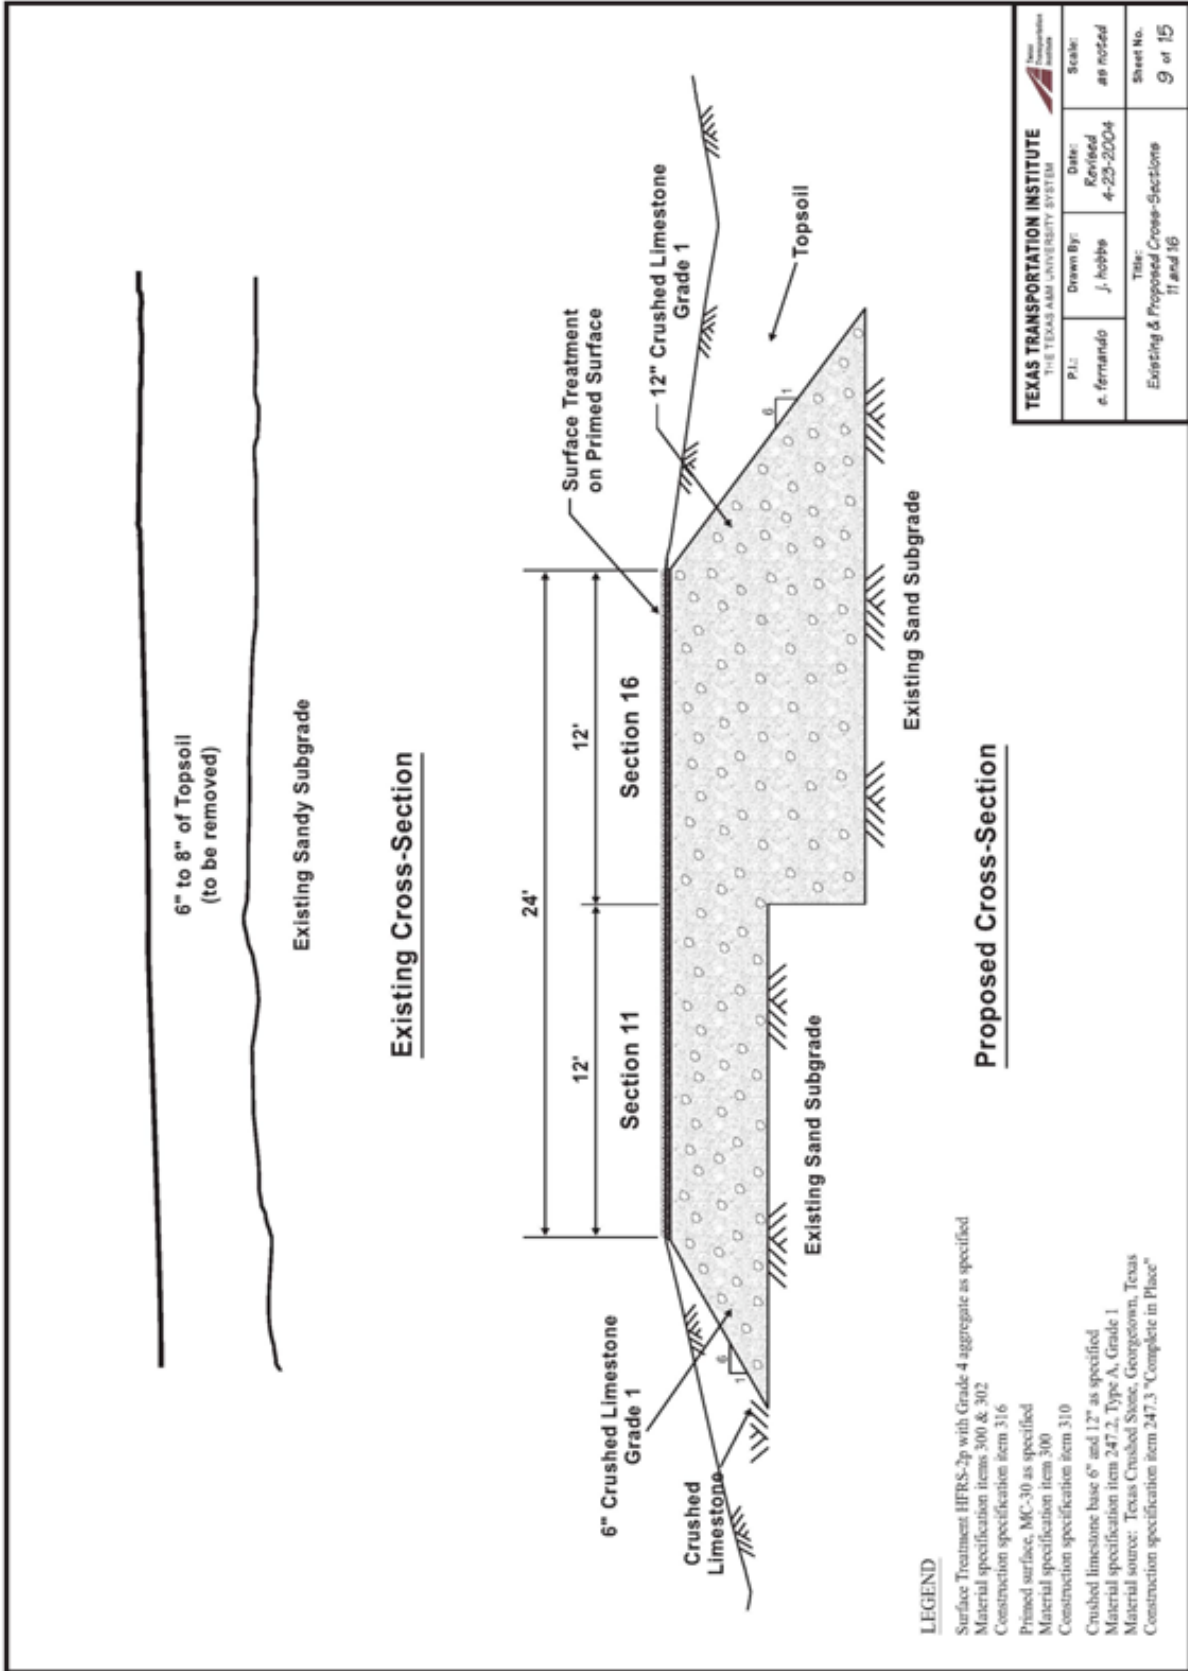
Existing and Proposed Cross-Sections for Sections 11 and 16.
